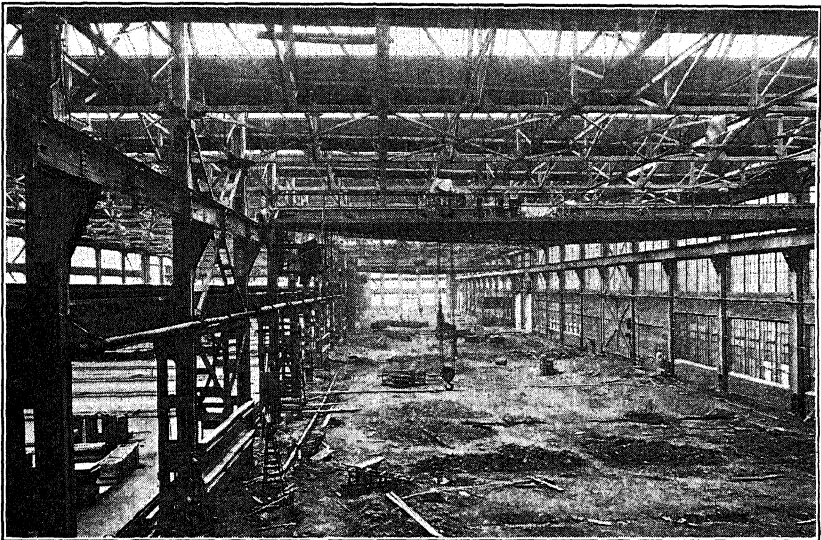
Typical Bracing System for Flat-Roofed Building.
